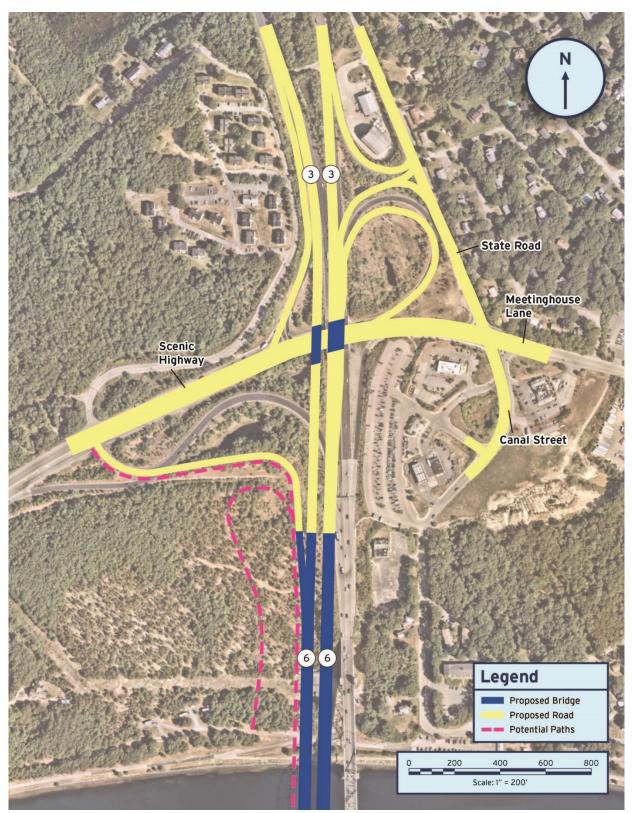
Sagamore North Crossing Interchange Approach - Direct Connection to State Road Alternative
